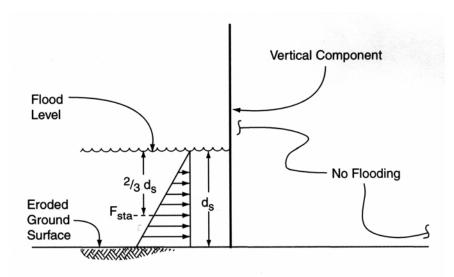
Pressure distribution due to standing water on the outside of a vertical wall. Reprinted with permission from the FEMA Coastal Construction Manual (FEMA, 2000).
